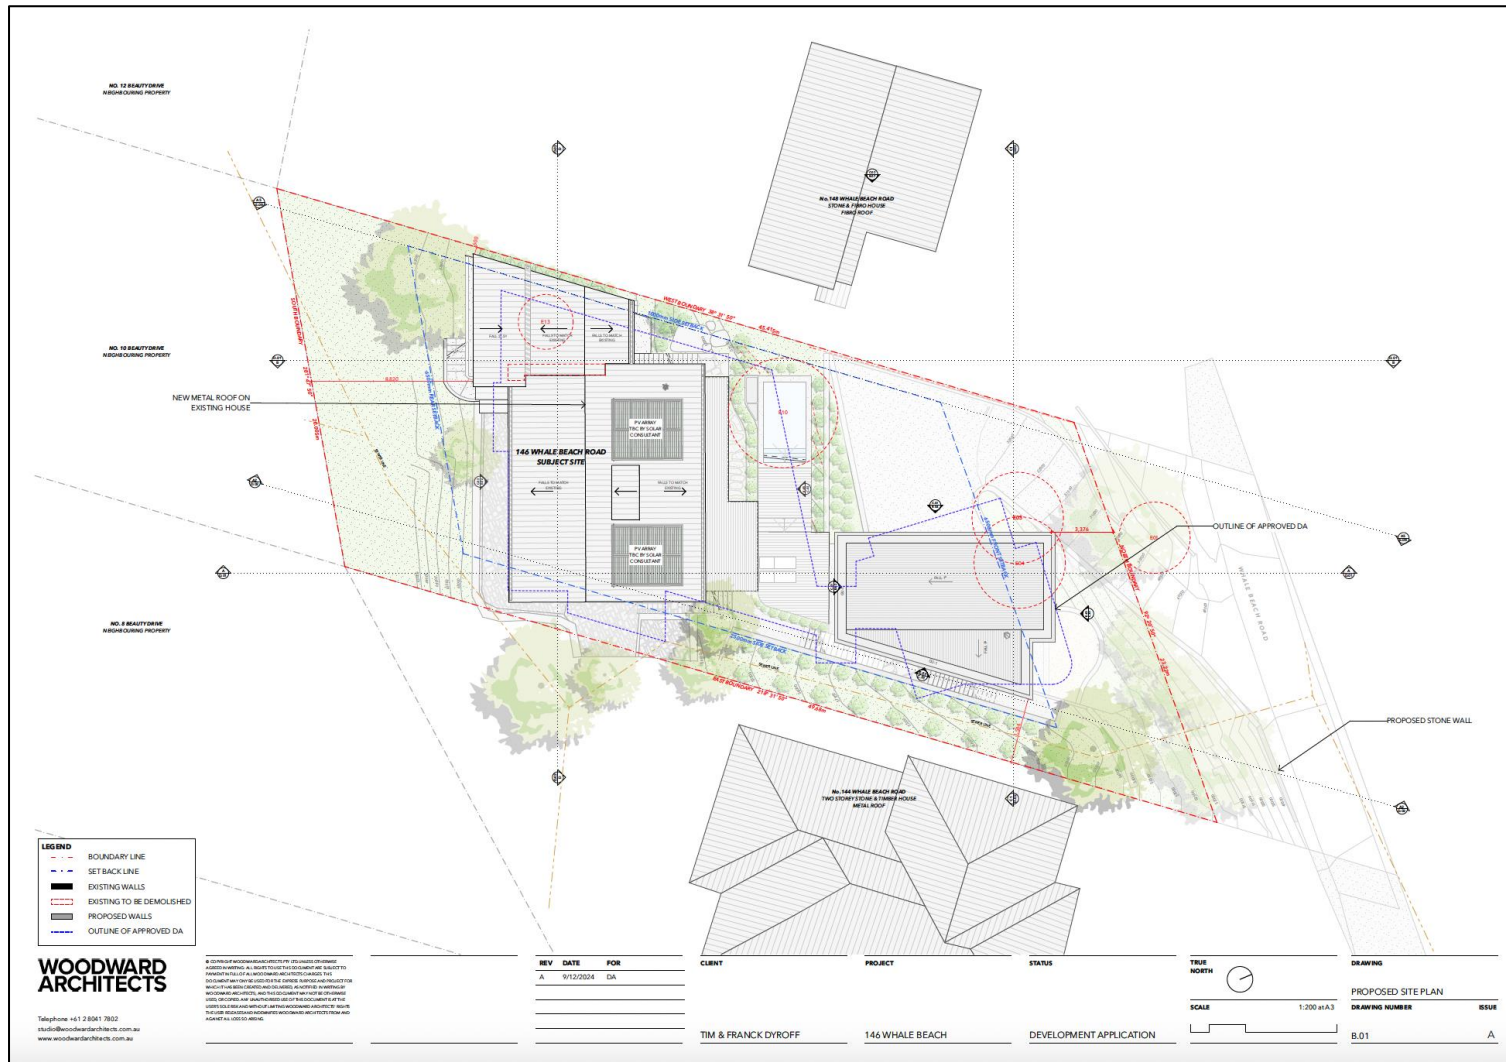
ILLUSTRATES PROPOSED SITEPLAN
